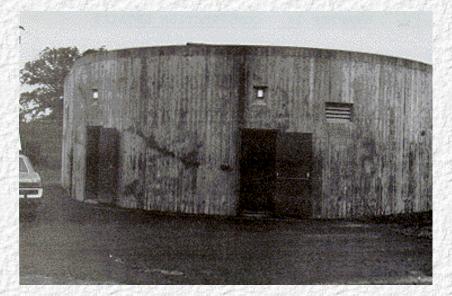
Poured Concrete Superstructure for Caisson-Type Pump Station
